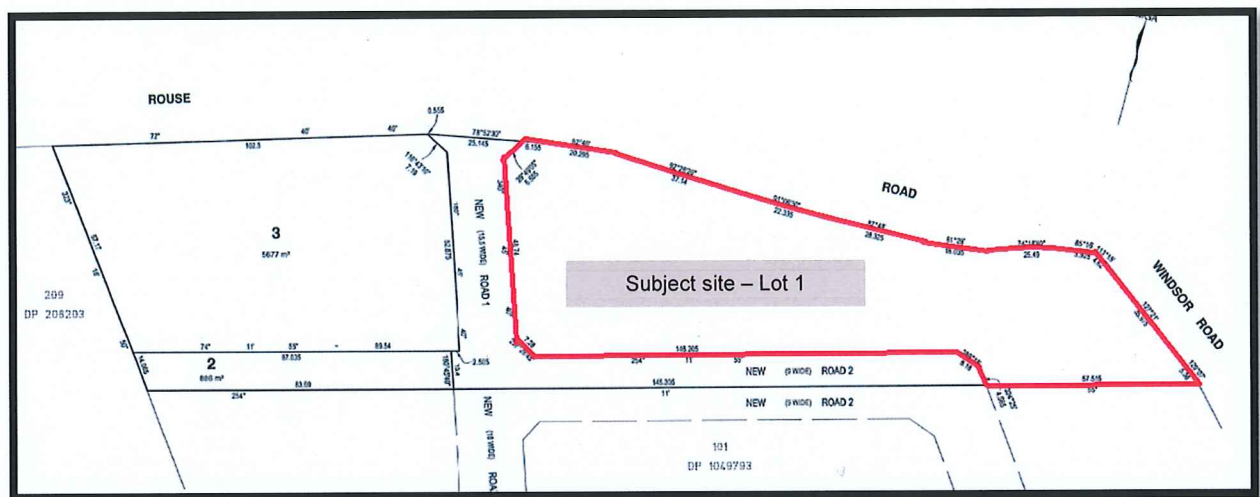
Approved subdivision plan under DA-15-1553 (Source: Zhinar Architects 2016)
